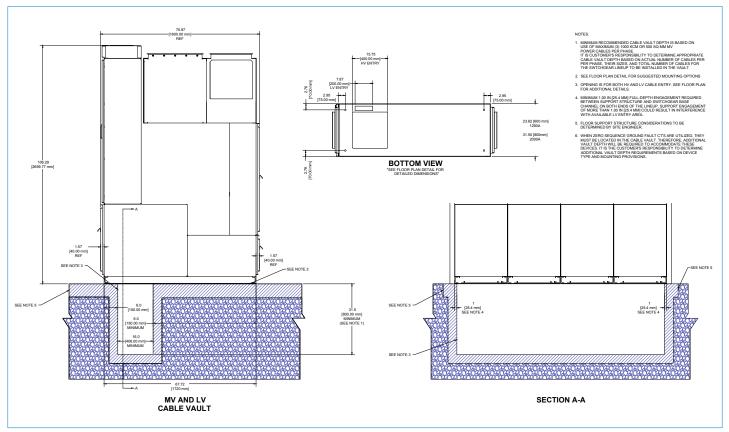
XGIS Cable Vault—Dimensions in Inches (mm)
